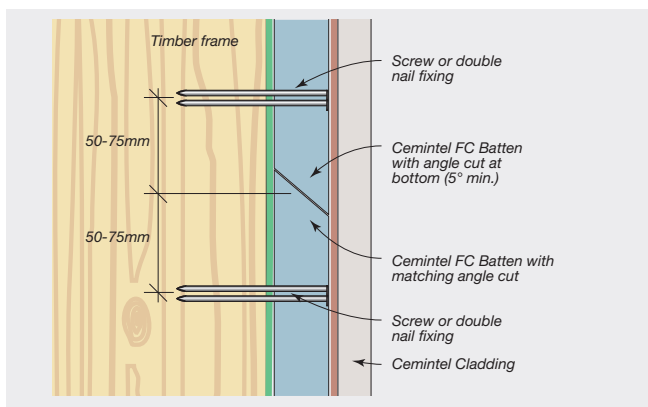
Typical 'Off-stud' Arrangement of Structural Battens
